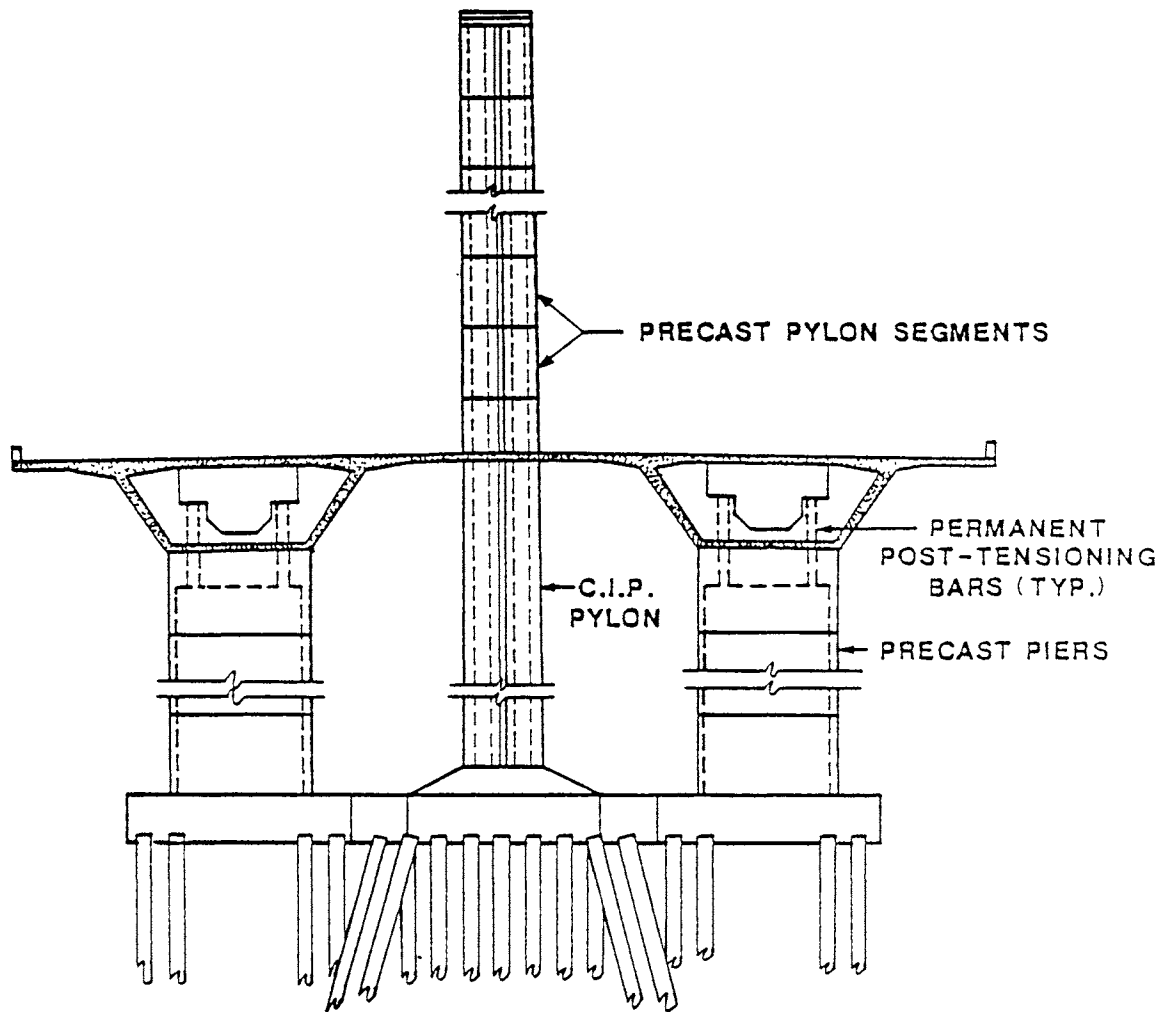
Bridge Section at Main Pier/Pylon Locations. CIP = cast in place.
